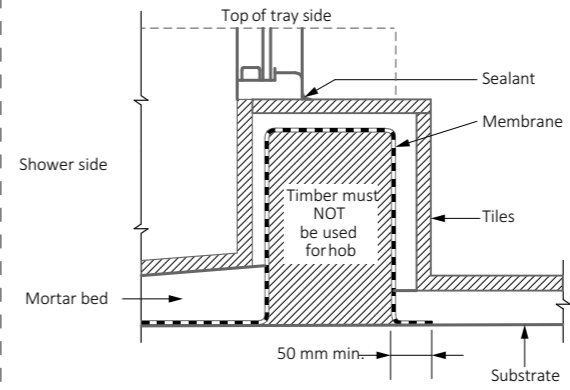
TYP HOB CONSTRUCTION
